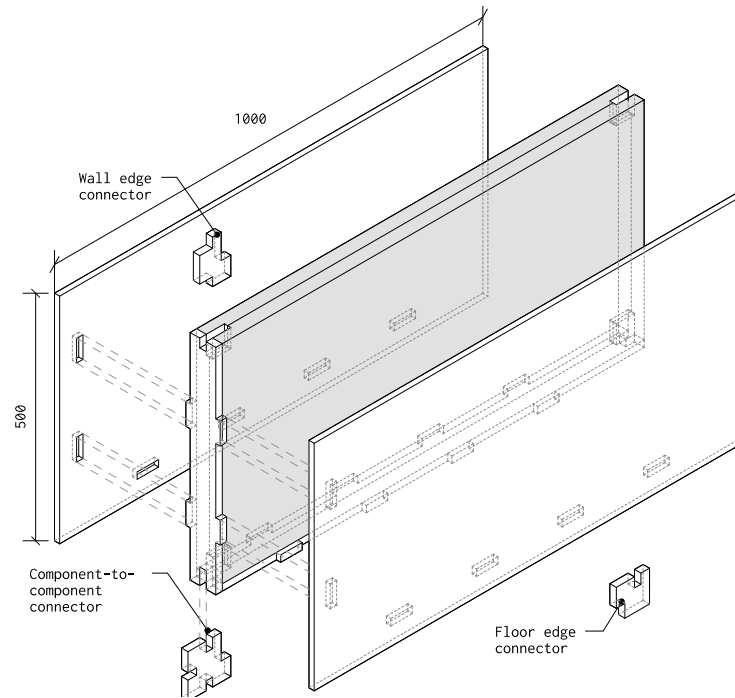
Exploded axonometry of ORW v2.0 type A component
